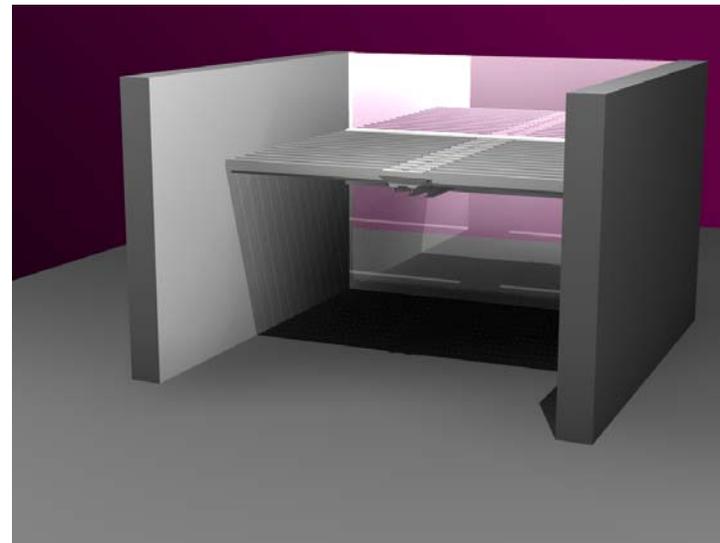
Repurposed Concrete palisades used as shading (summer) (Source: Own Image)
